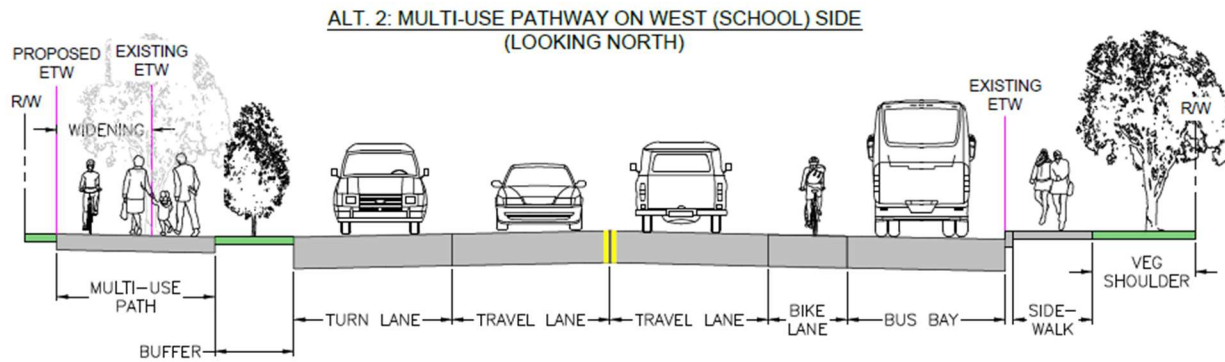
Ringwood Avenue Alternative 2 Near MAHS
